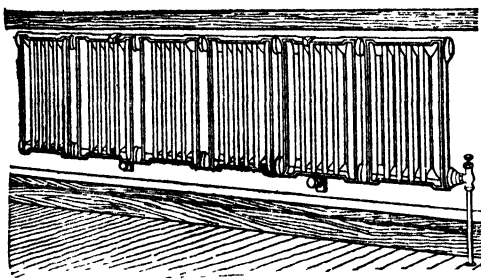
Typical Installation of Rococo Wall-radiators in Single Tier on Adjustable Brackets
